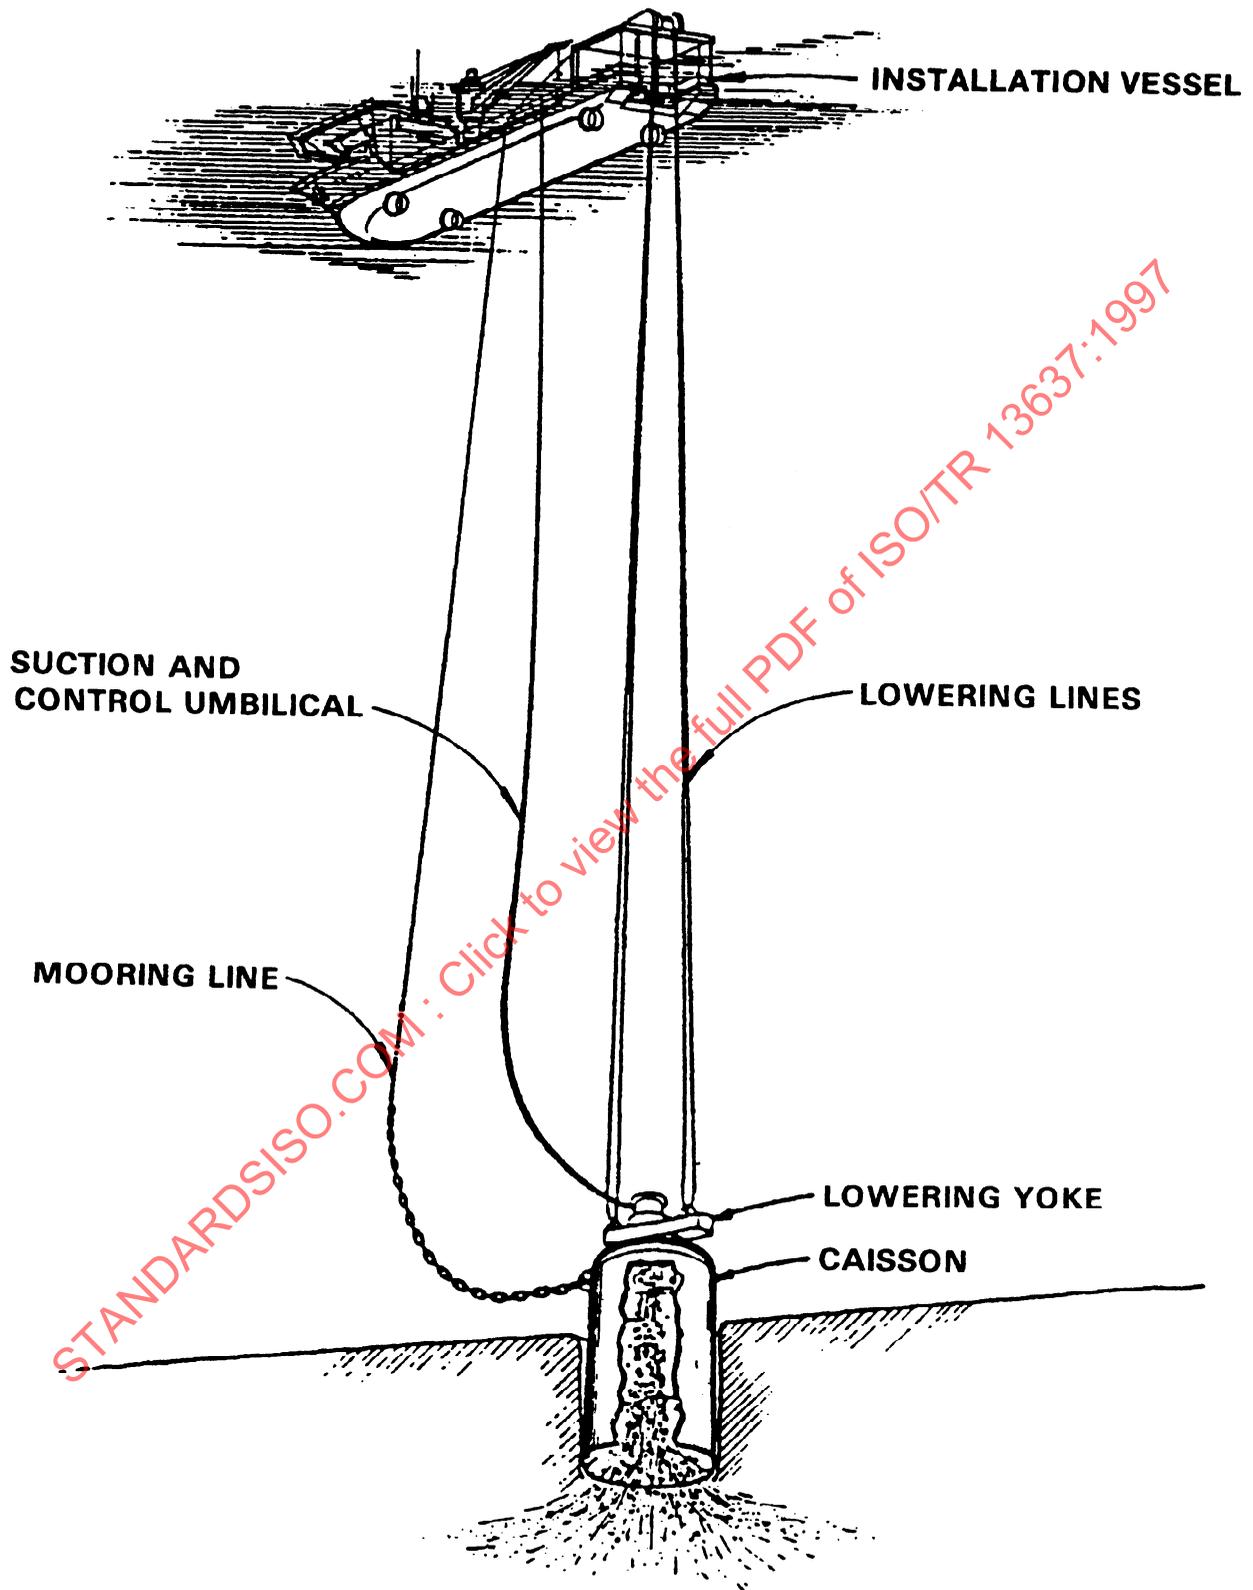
Installation of Caisson Foundation (Suction Anchor)
